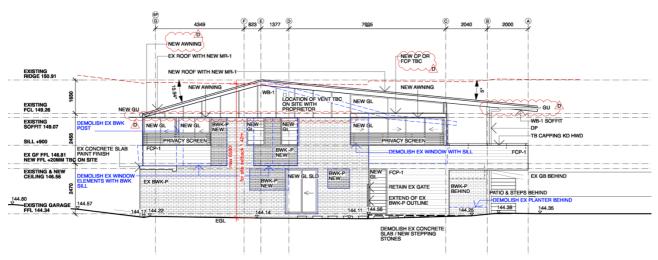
CDC North (Side) Elevation Jones Street, Beacon Hill
